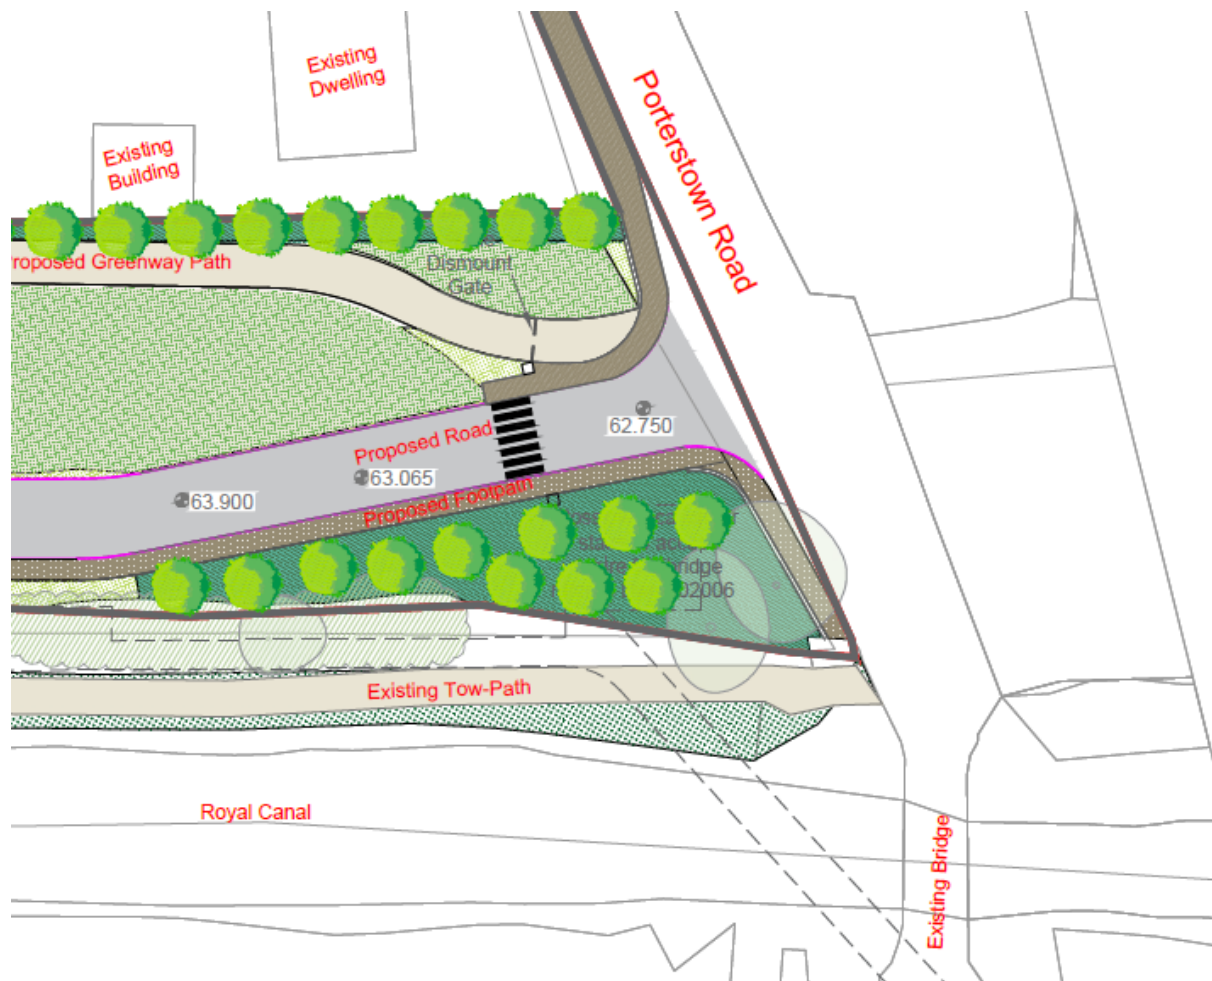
Large amount of trees and shrubs blocking access to proposed new pedestrian and cycle bridge PP252-02 Detailed Landscape
